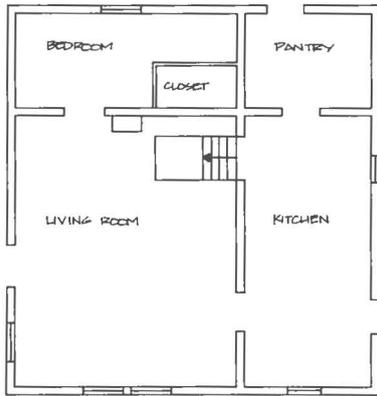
Hans and Marie Simonsen house. Floor plan, first floor.
